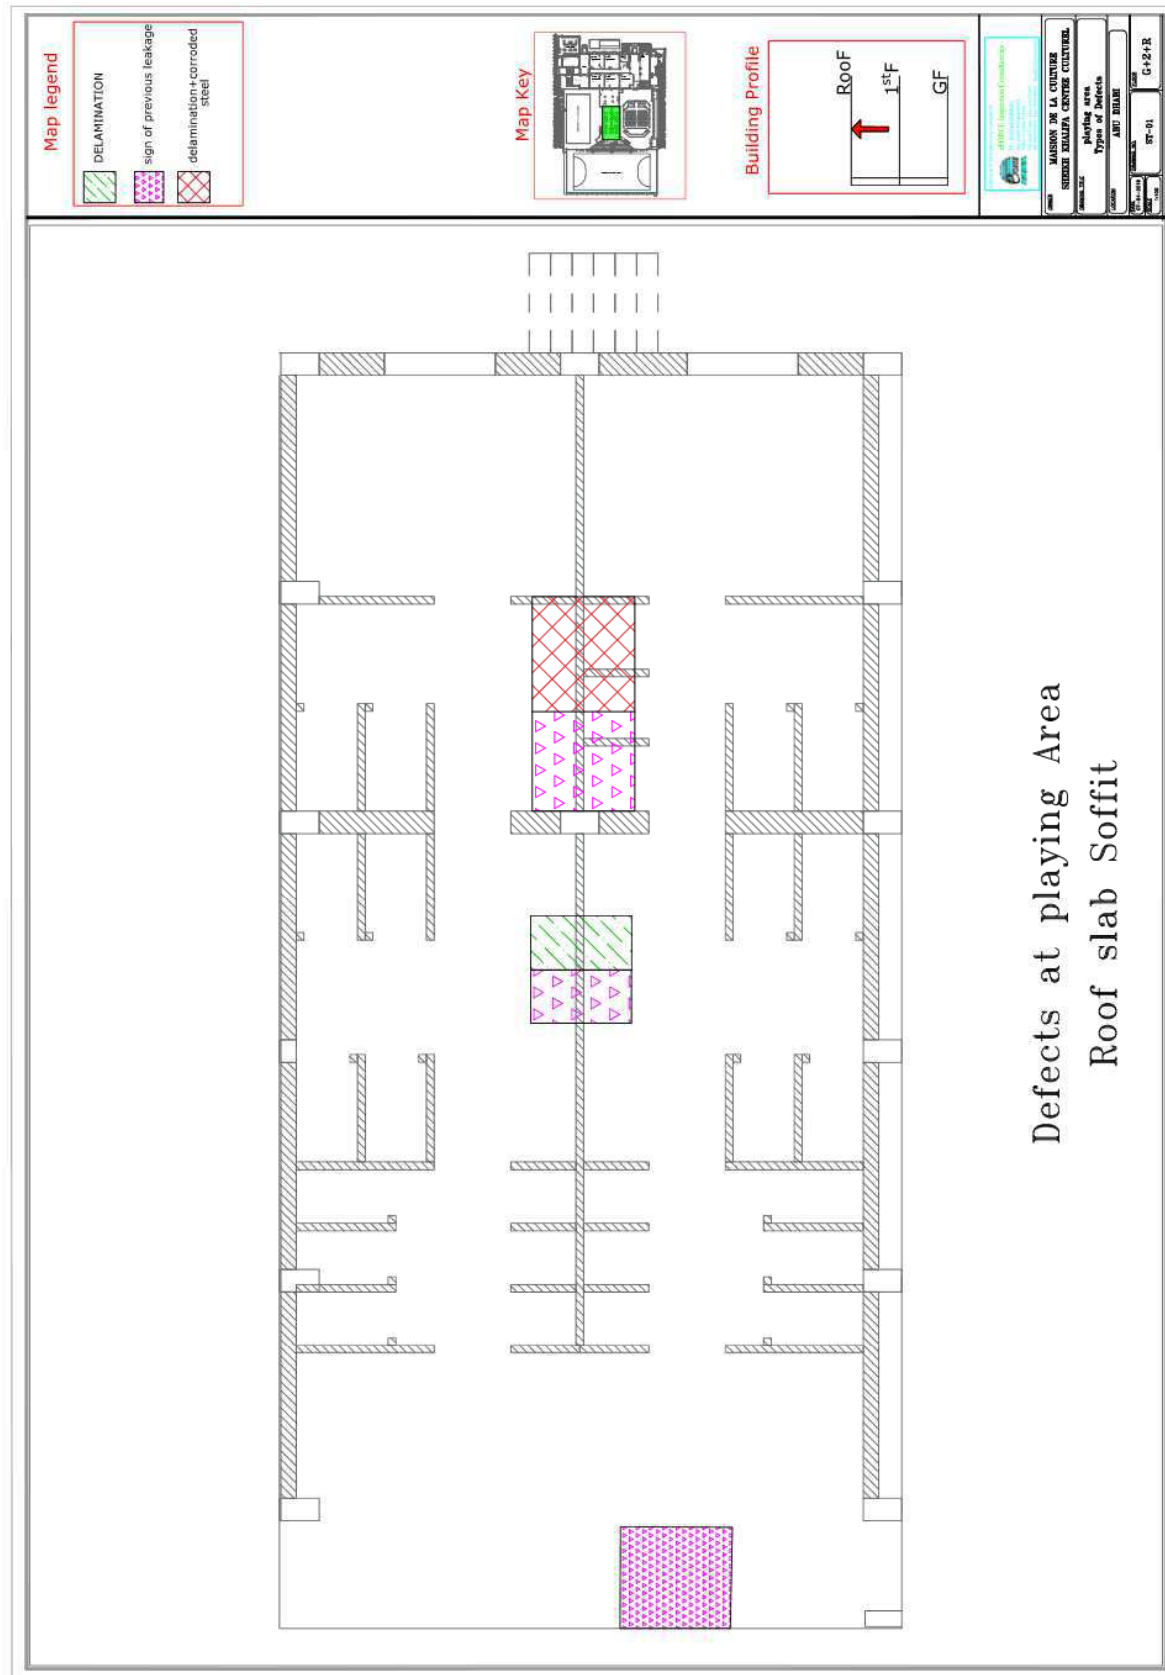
Defects in playing area in roof slab soffit.
